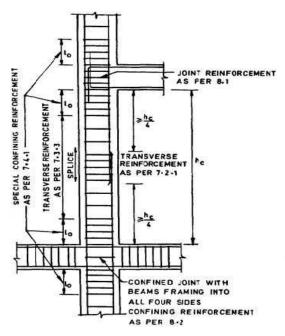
Typical Column Reinforcement (IS 13920:1993)
